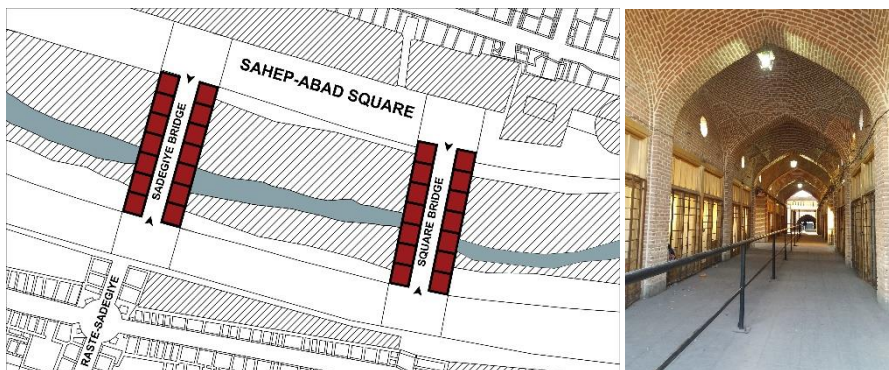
The ground floor plan of Pol- bazaar and the interior view (D. Rostamzade)
